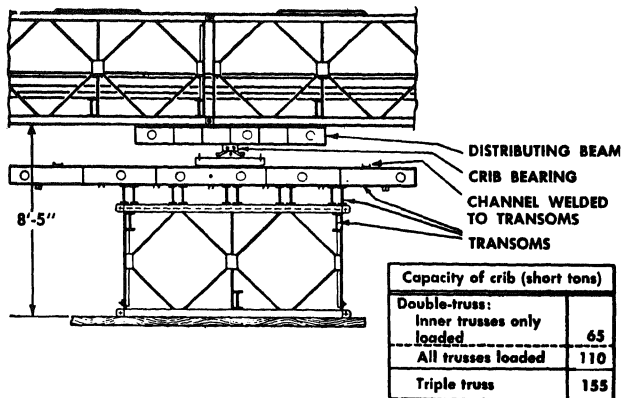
Panel crib piers with expedient flat tops and rocker bridge bearing under continuous bridge. Single-story single-bay crib with panels horizontal.
